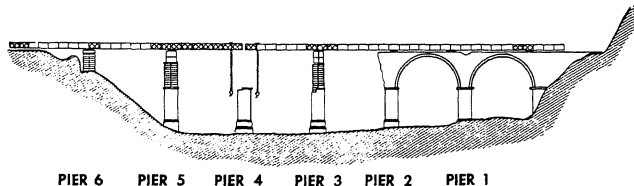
Pier 4 constructed from ends of bridge cantilevered out from each bank.
